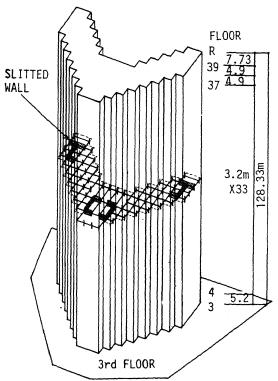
PERSPECTIVE DRAWING OF THE TOWER
